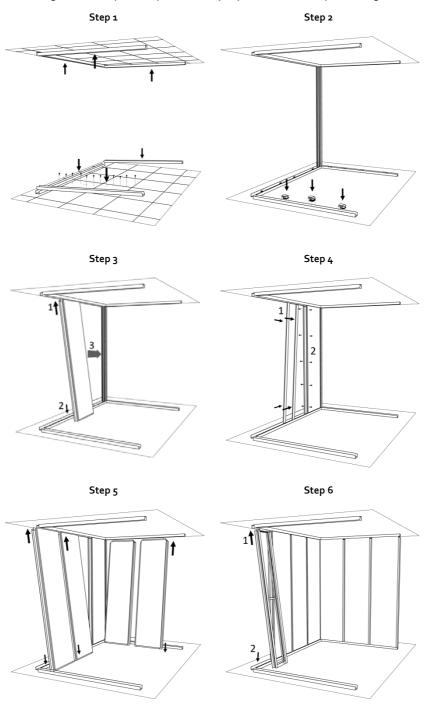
Flexible solutions for the floor and ceiling assemblies
